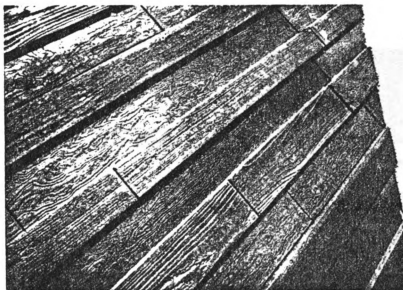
GFRP 'Timber' Cladding Detail (Reference 60).
